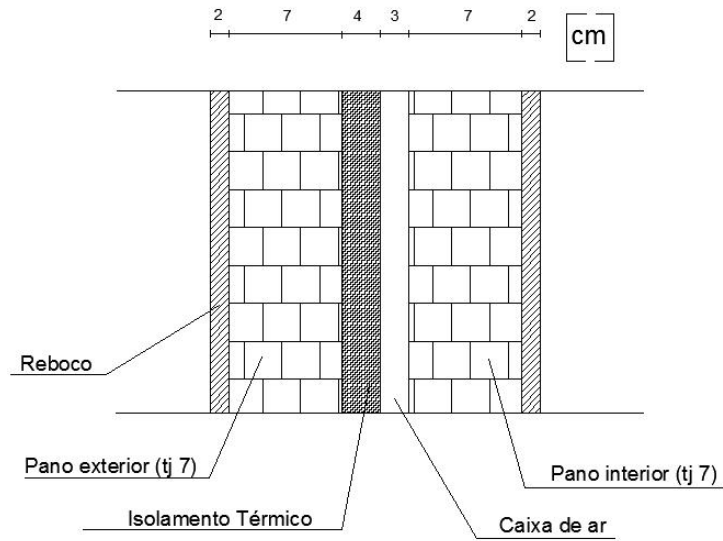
Section of the masonry wall in a plane perpendicular to the RC plane frame
